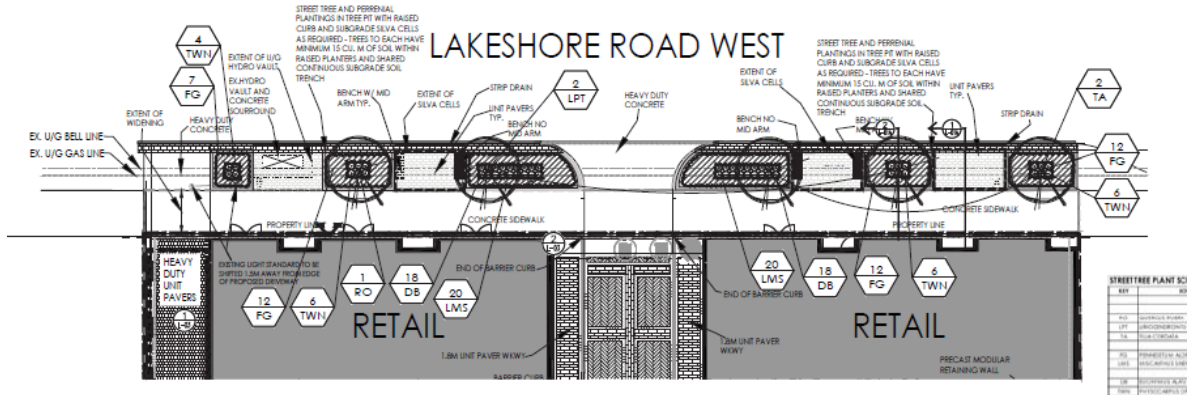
Extract from 'ultimate streetscape plan' of site plan SP.1729.041/02
